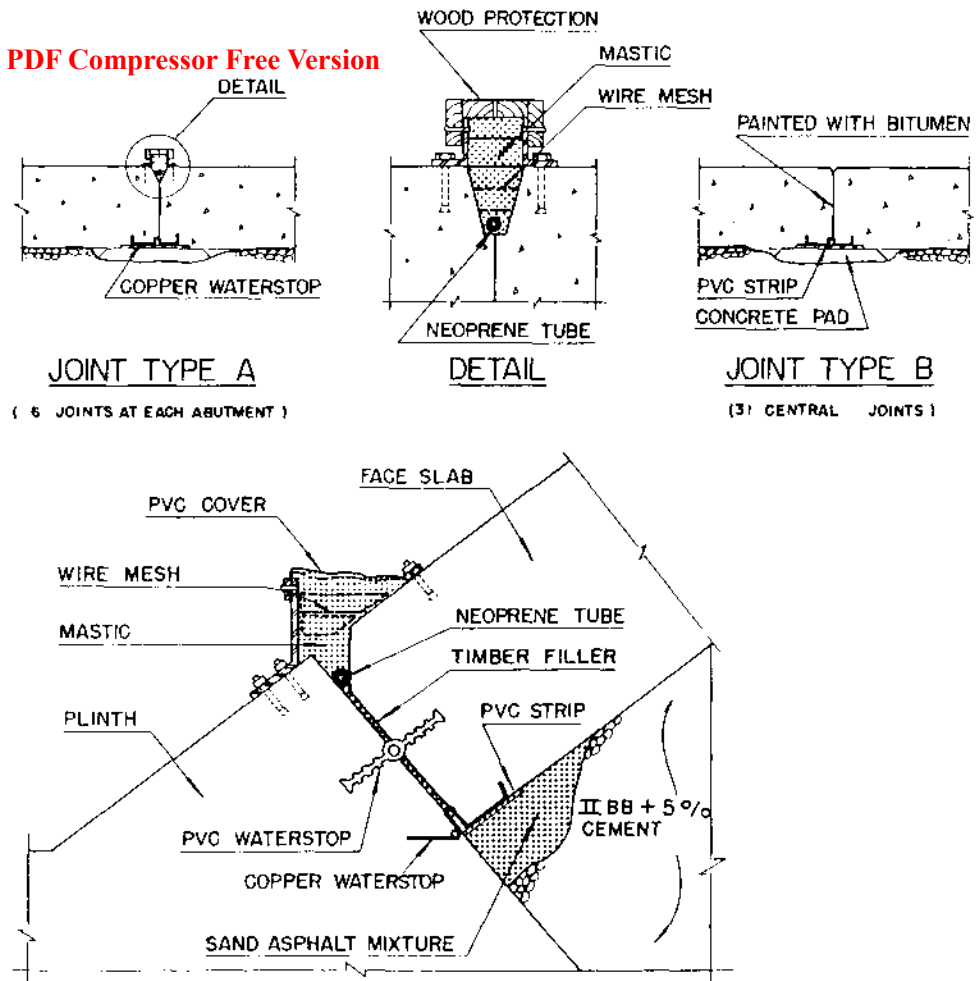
Joint details for Segredo Dam (Pinto et al. 1985).
